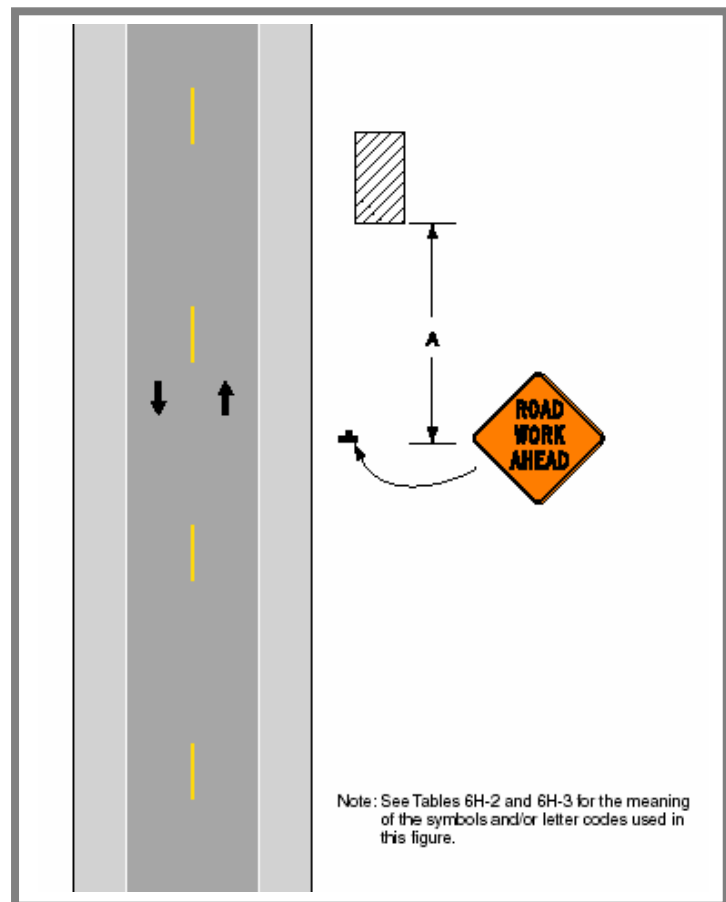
Typical application for Work Beyond the Shoulder from MUTCD, Section 6
